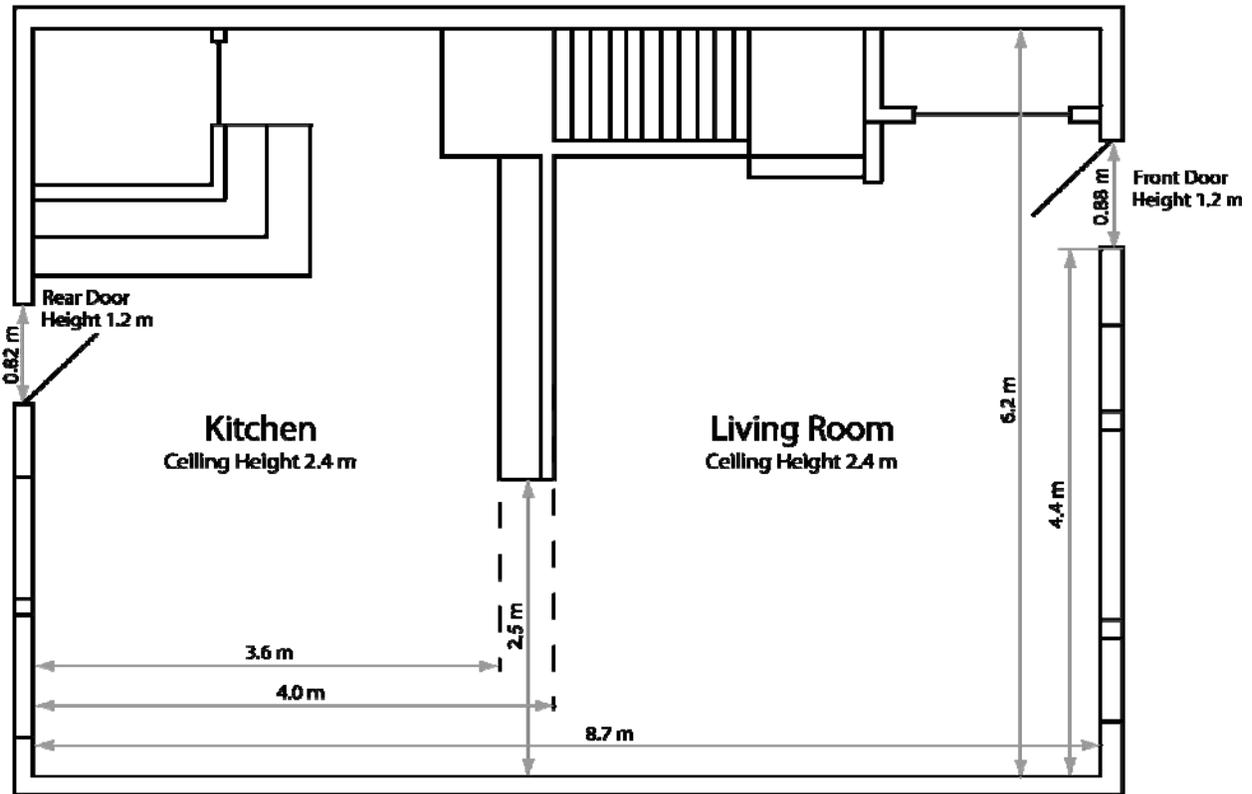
Floorplan of the first level of the townhouses, showing room and door dimensions.
